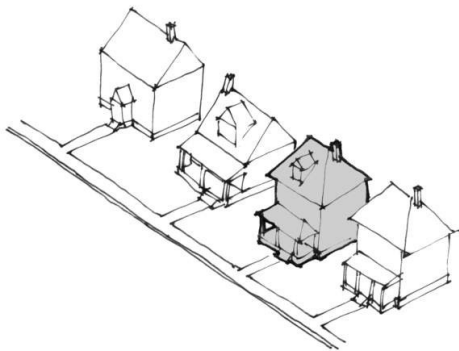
The second house from the right is compatible with the other three houses in orientation to the street, massing, height, floor to ceiling heights, and foundation heights.
